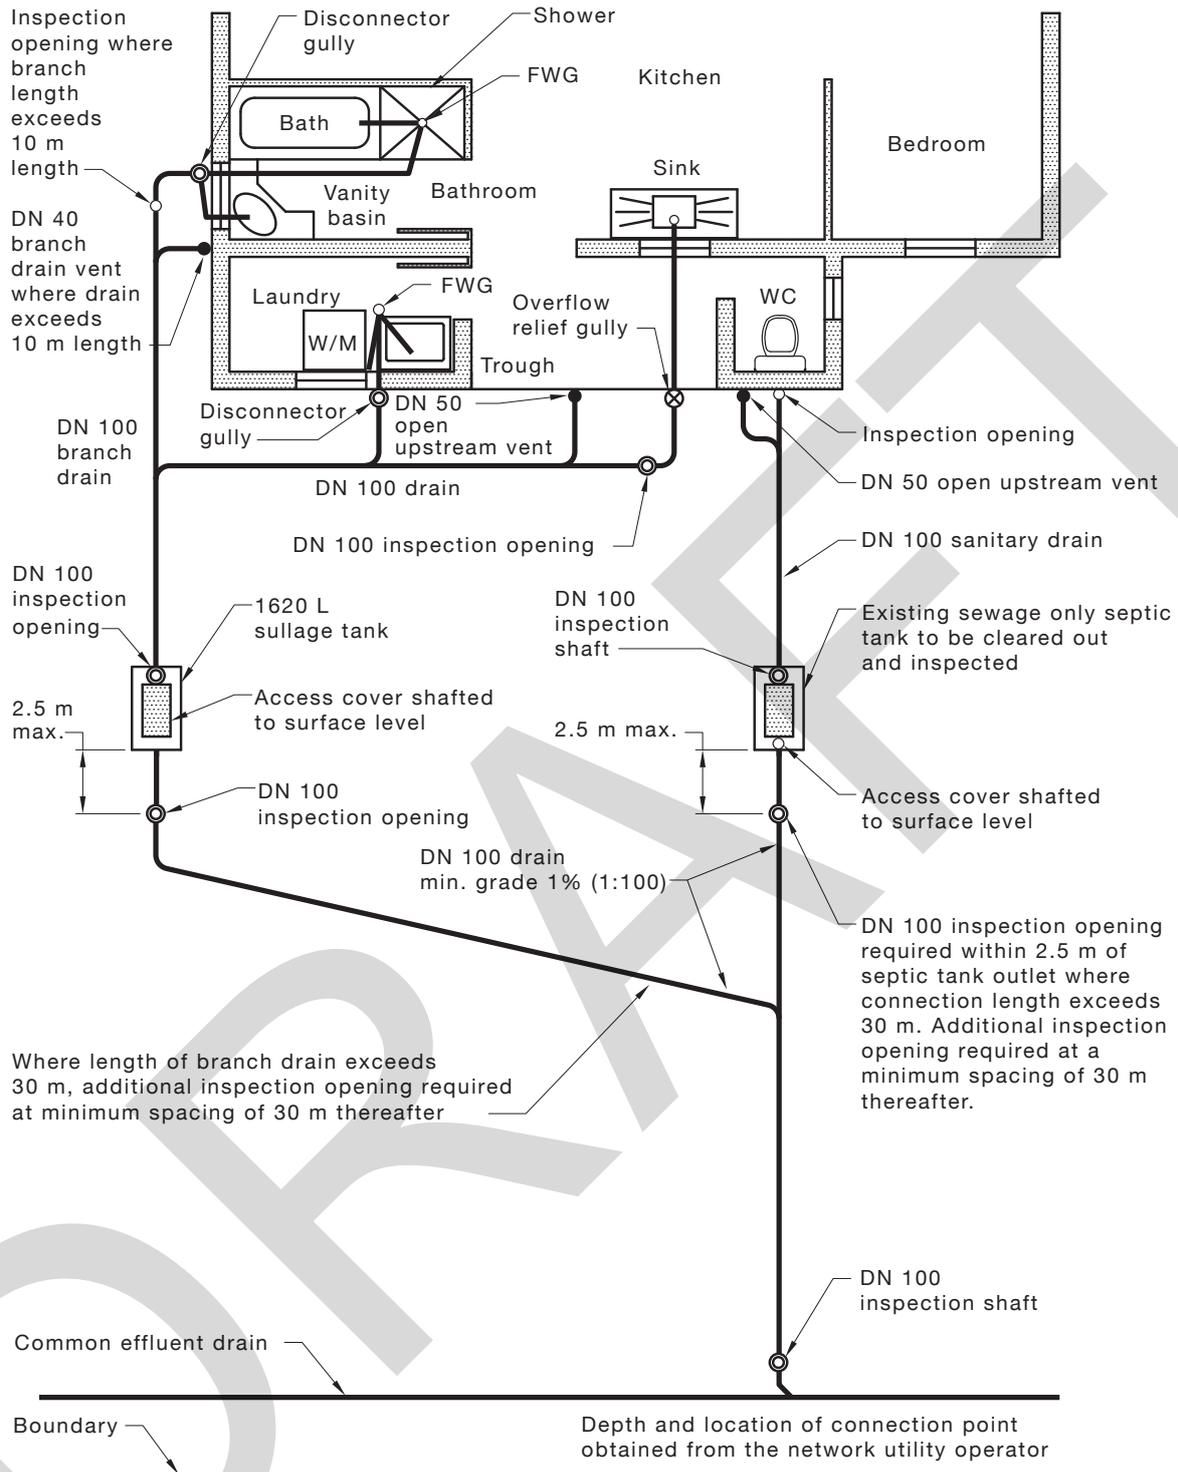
(D) TYPICAL CONNECTION DETAILS FOR A SEPTIC TANK AND SULLAGE TANK SYSTEM
